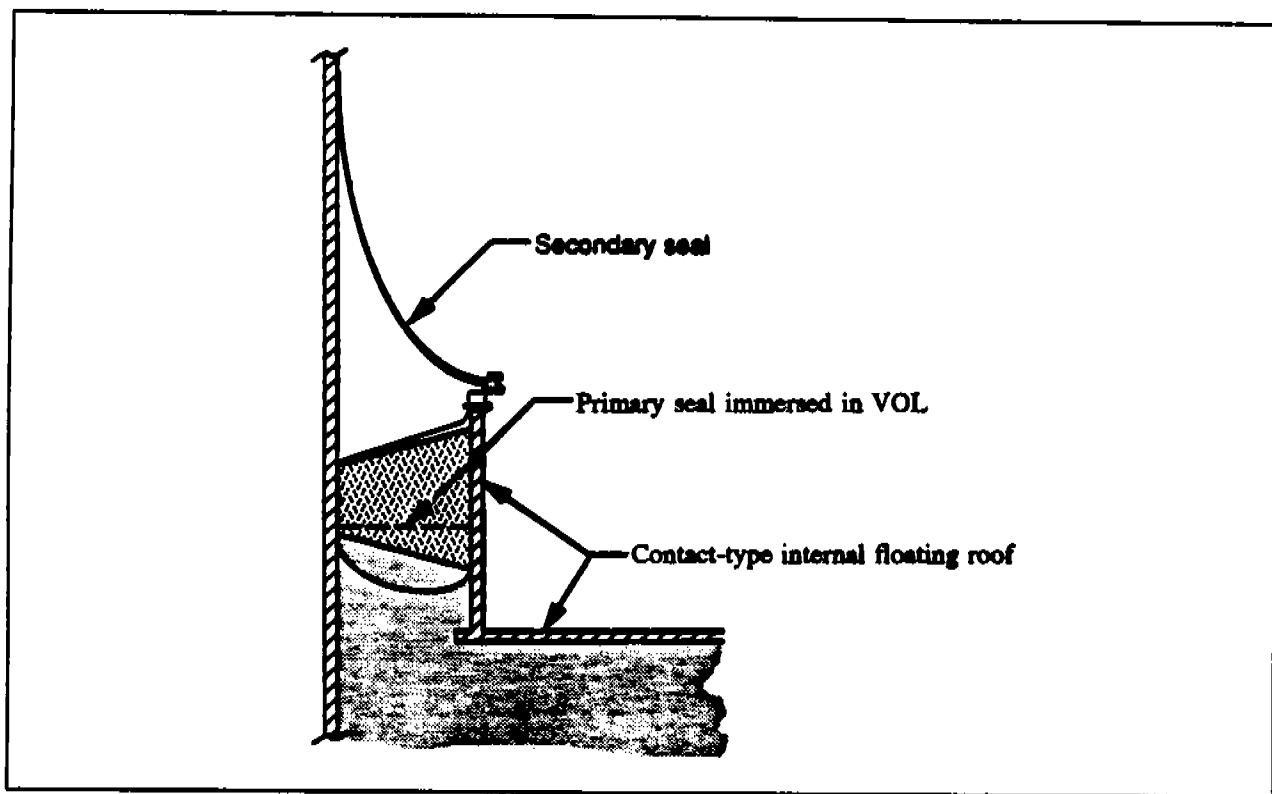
Rim-mounted secondary seal on an internal floating roof.⁵
